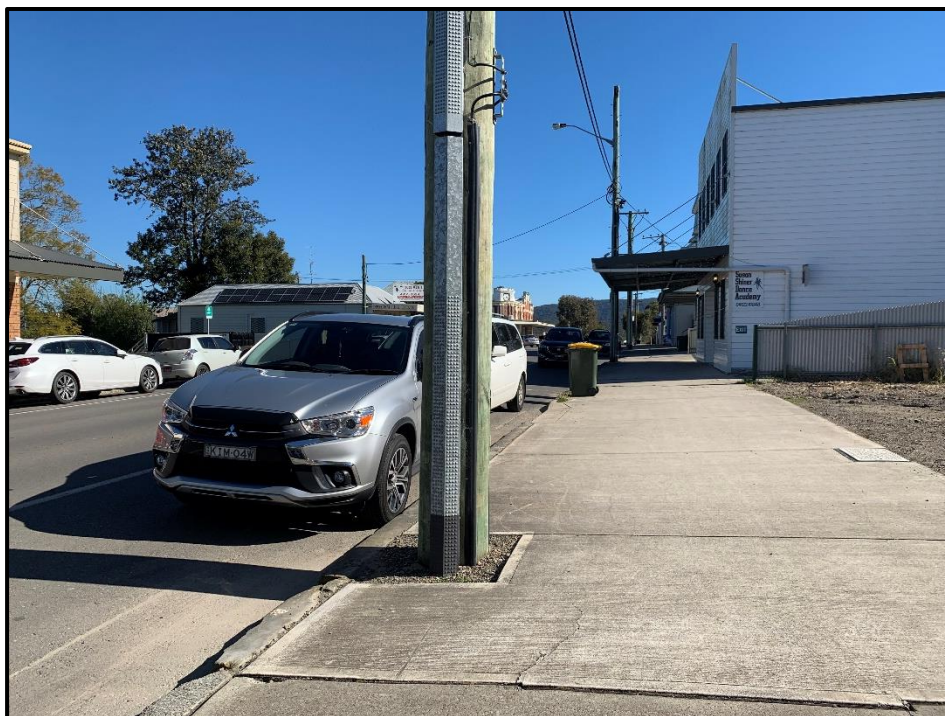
View looking west (right) along Carrington Street from existing driveway crossover showing parked cars adjacent to driveway.
